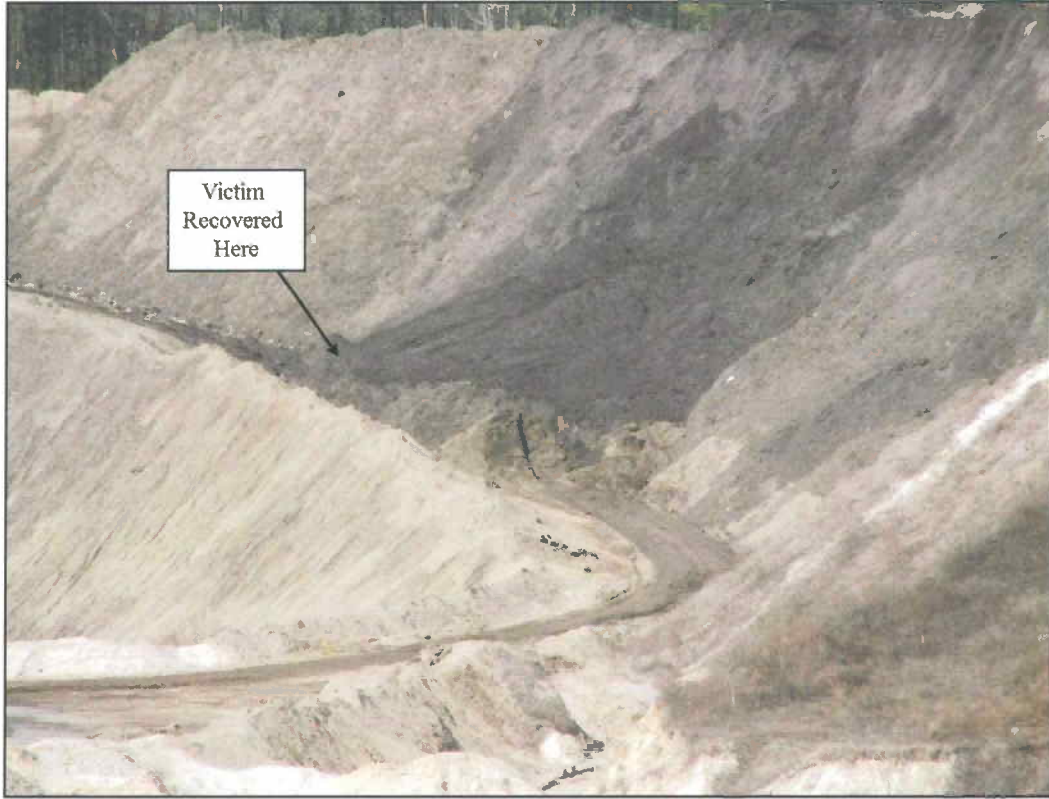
View of reclamation dump site and failure looking toward the northwest.
